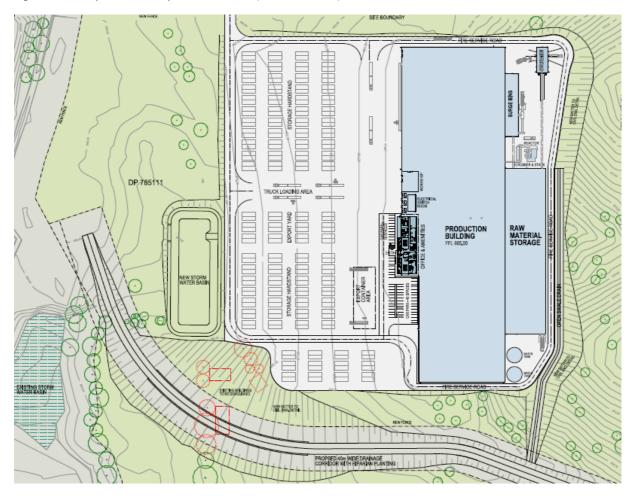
Proposed Development Site Plan (SBA Architects)
